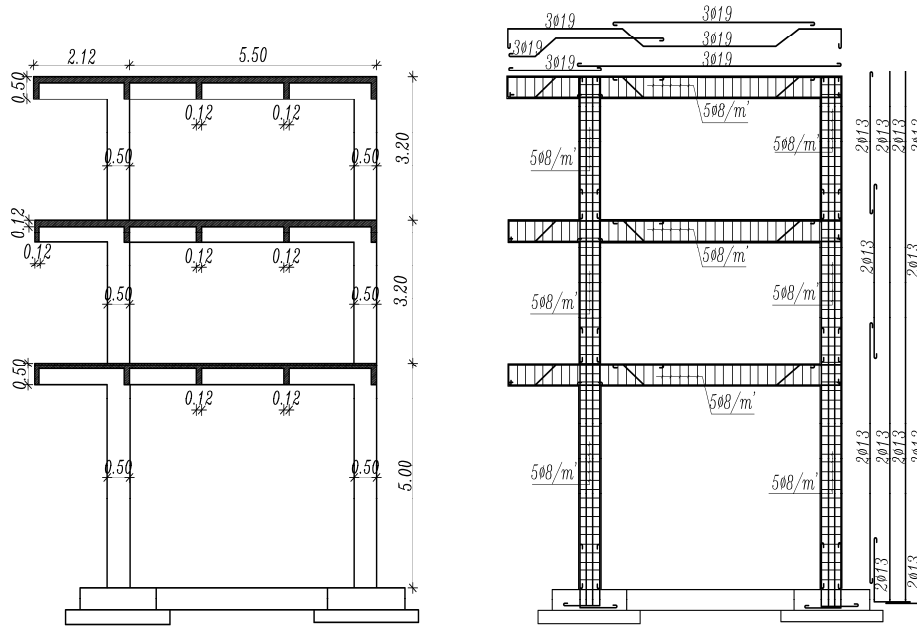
Dimensions and reinforcing steel details of reference structure (B1)
